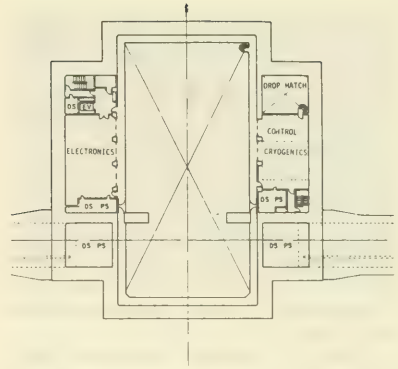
(b). A floor plan of the side gallery of the Fuji hall at the first basement (B1). On one side, a central control room for the cryogenic system will be installed and on the other side, a room for electronic work is planned.
